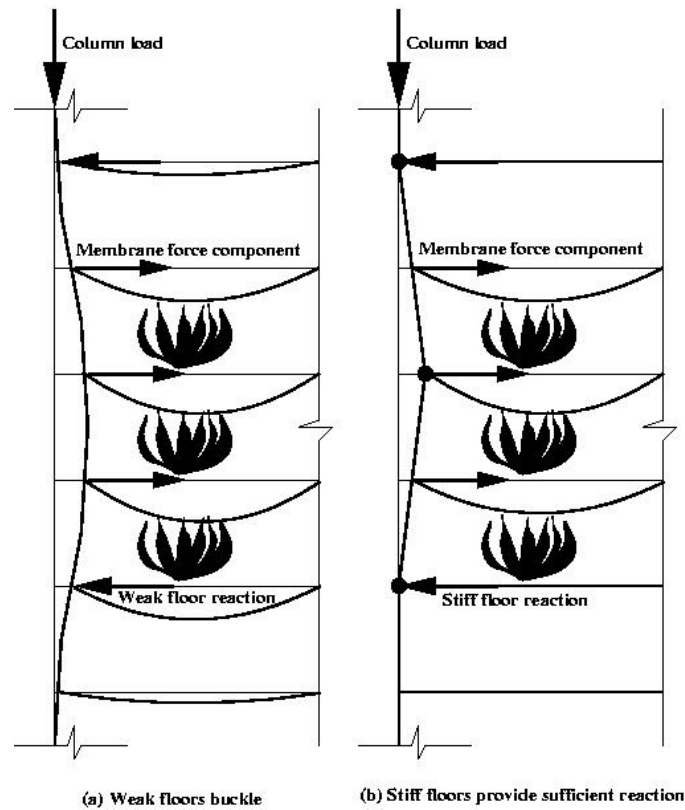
Mechanics of fire induced collapse in weak and stiff floor buildings
